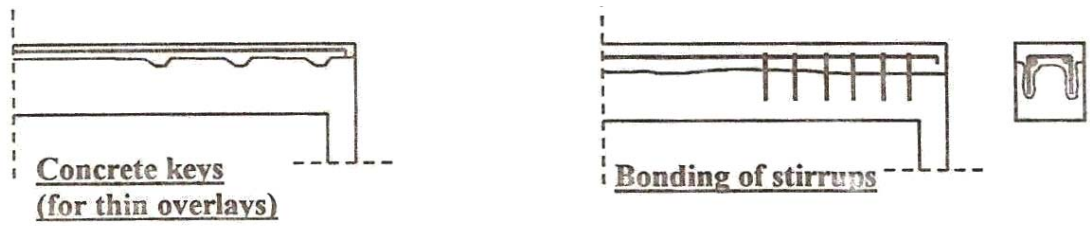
Jacketing Reinforcement Details ^[3].
